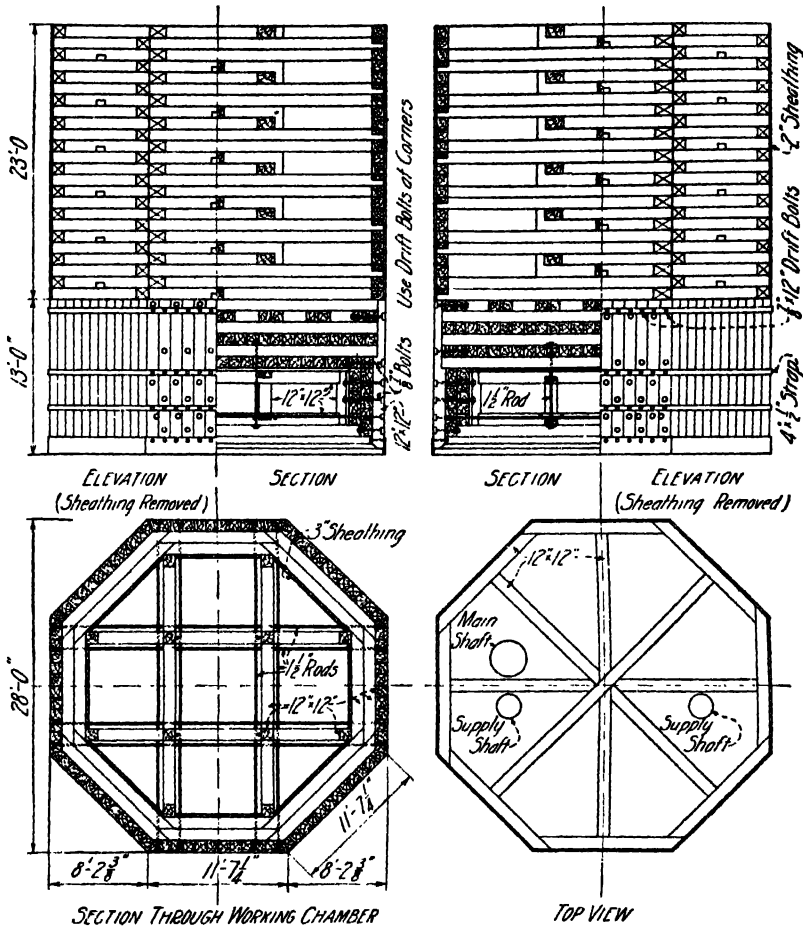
Details of Pneumatic Caisson for Pivot-pier of the Granville Street Bridge over False Creek in Vancouver, B. C.
